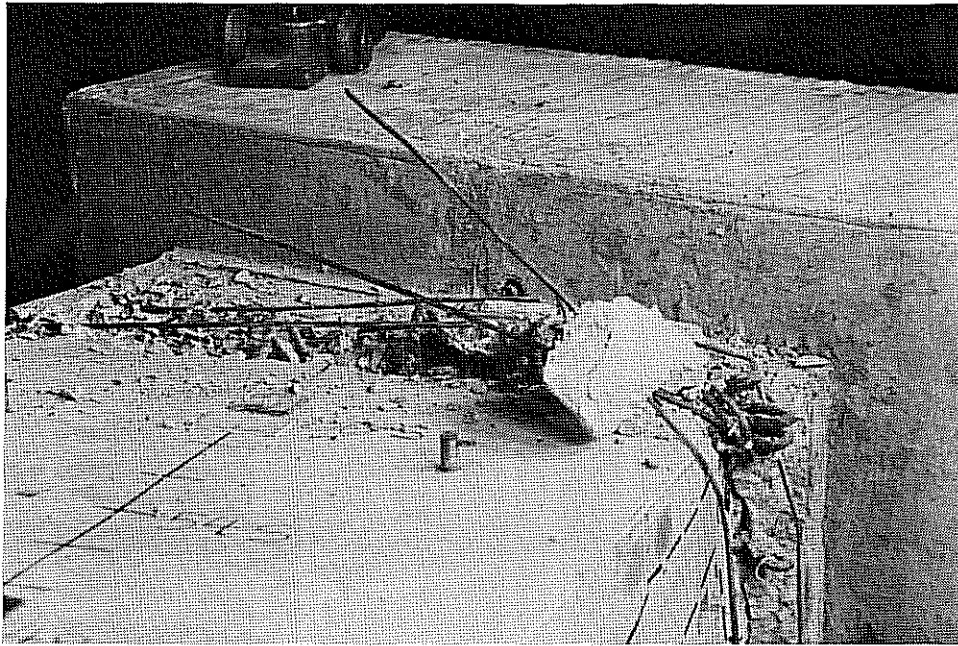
Specimen 10ML18 Side Face Close-Up
